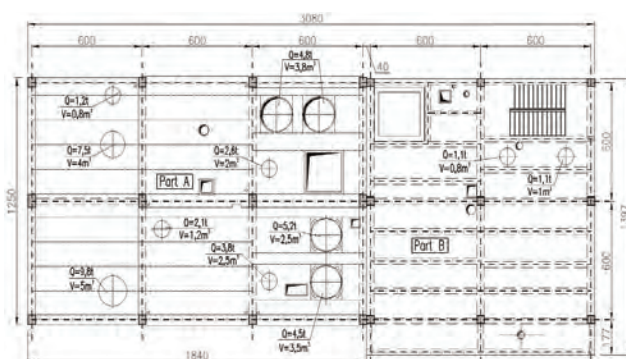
Plan of the flooring system structure at the level of +4.20 (first floor slab)
